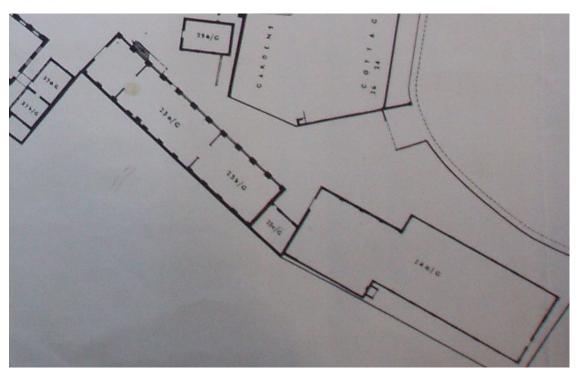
Buildings U (left) and V (right) Detail from a revised ground-floor block plan¹⁶
